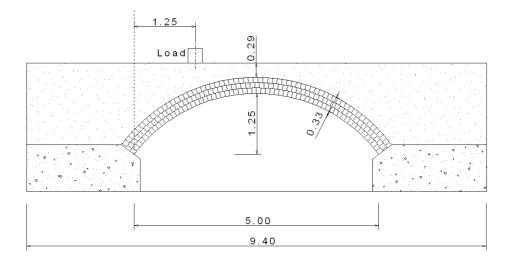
5m Span TRL Laboratory Arch - Mortared and Separated Rings
